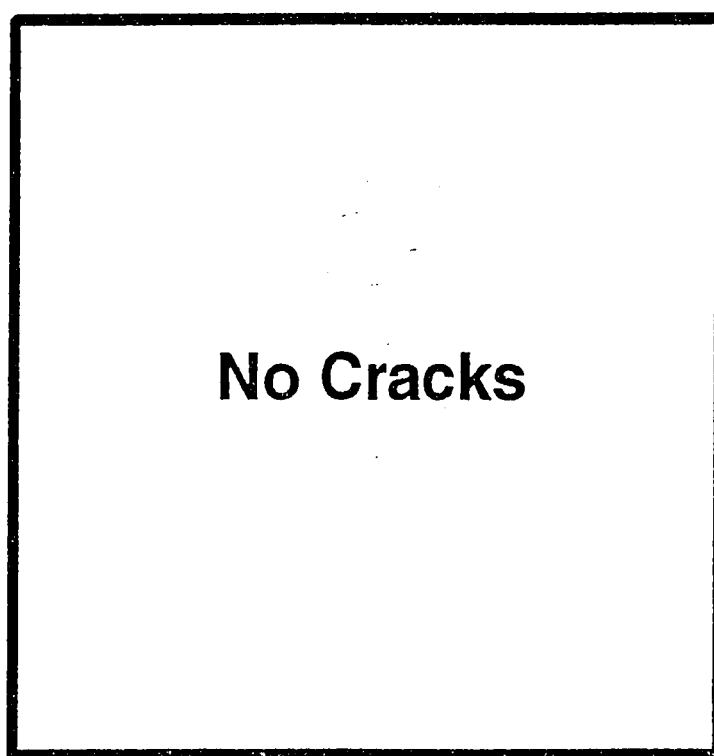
Typical Plastic Shrinkage Cracks in the Concrete Specimens Exposed to a RH of 95 % and Temperature of 45 °C
